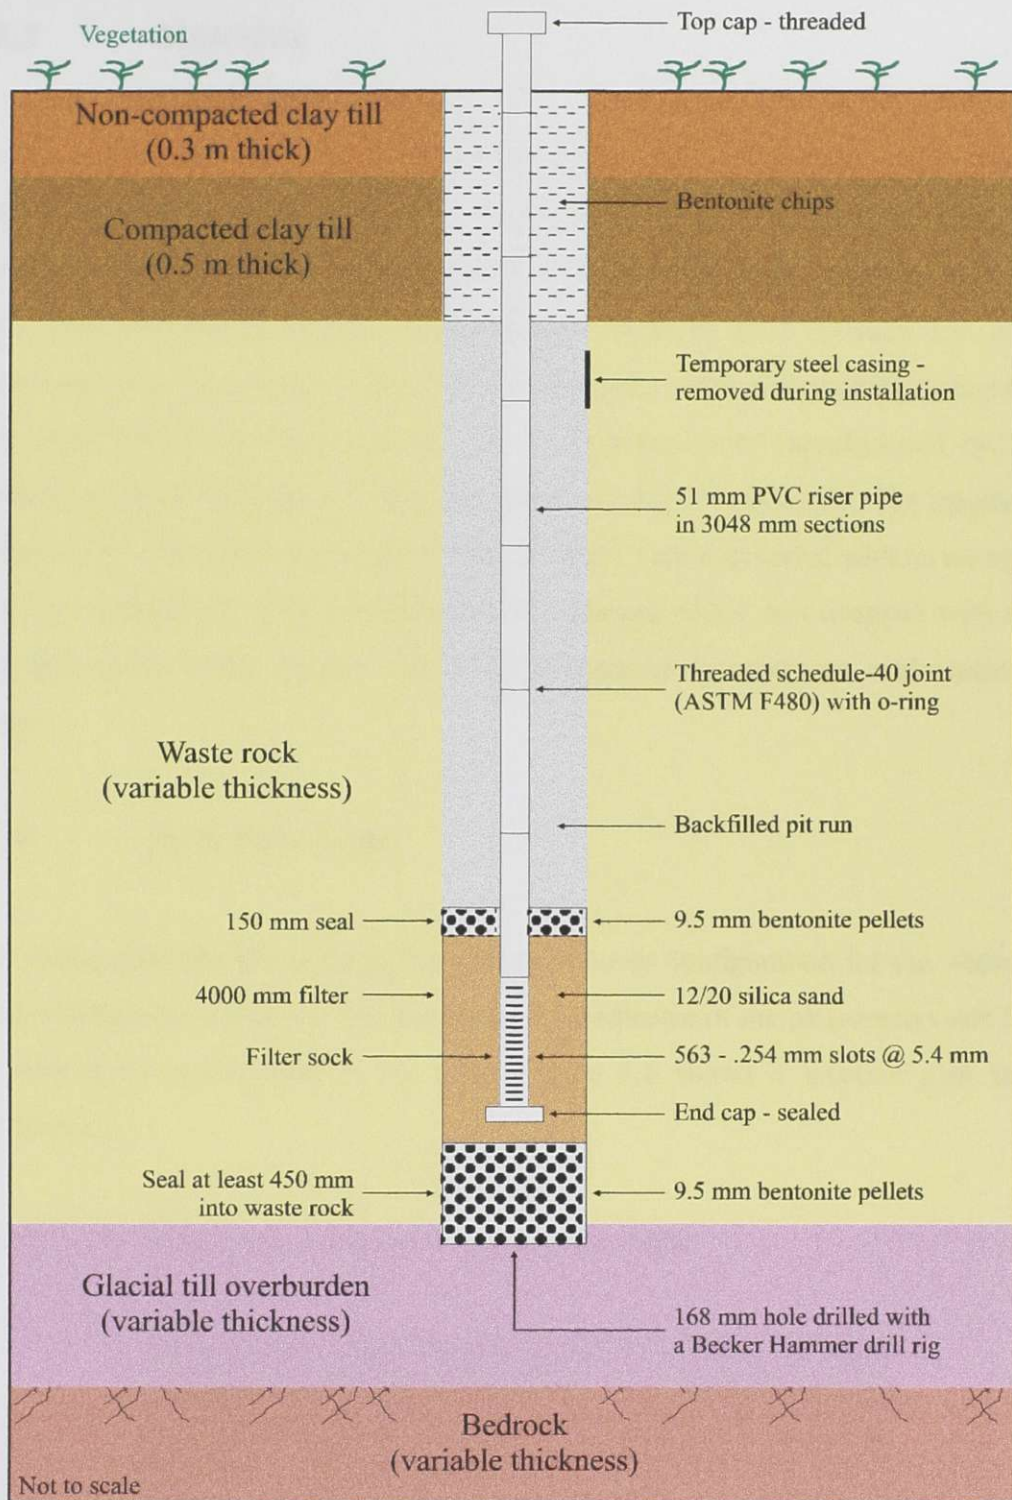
Plan of the piezometers installed in the waste rock dump.
